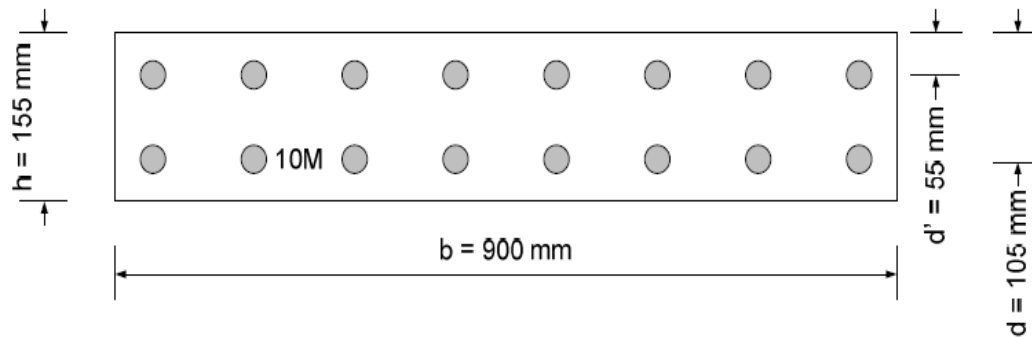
Detail of single slab cross section and reinforcement arrangement
